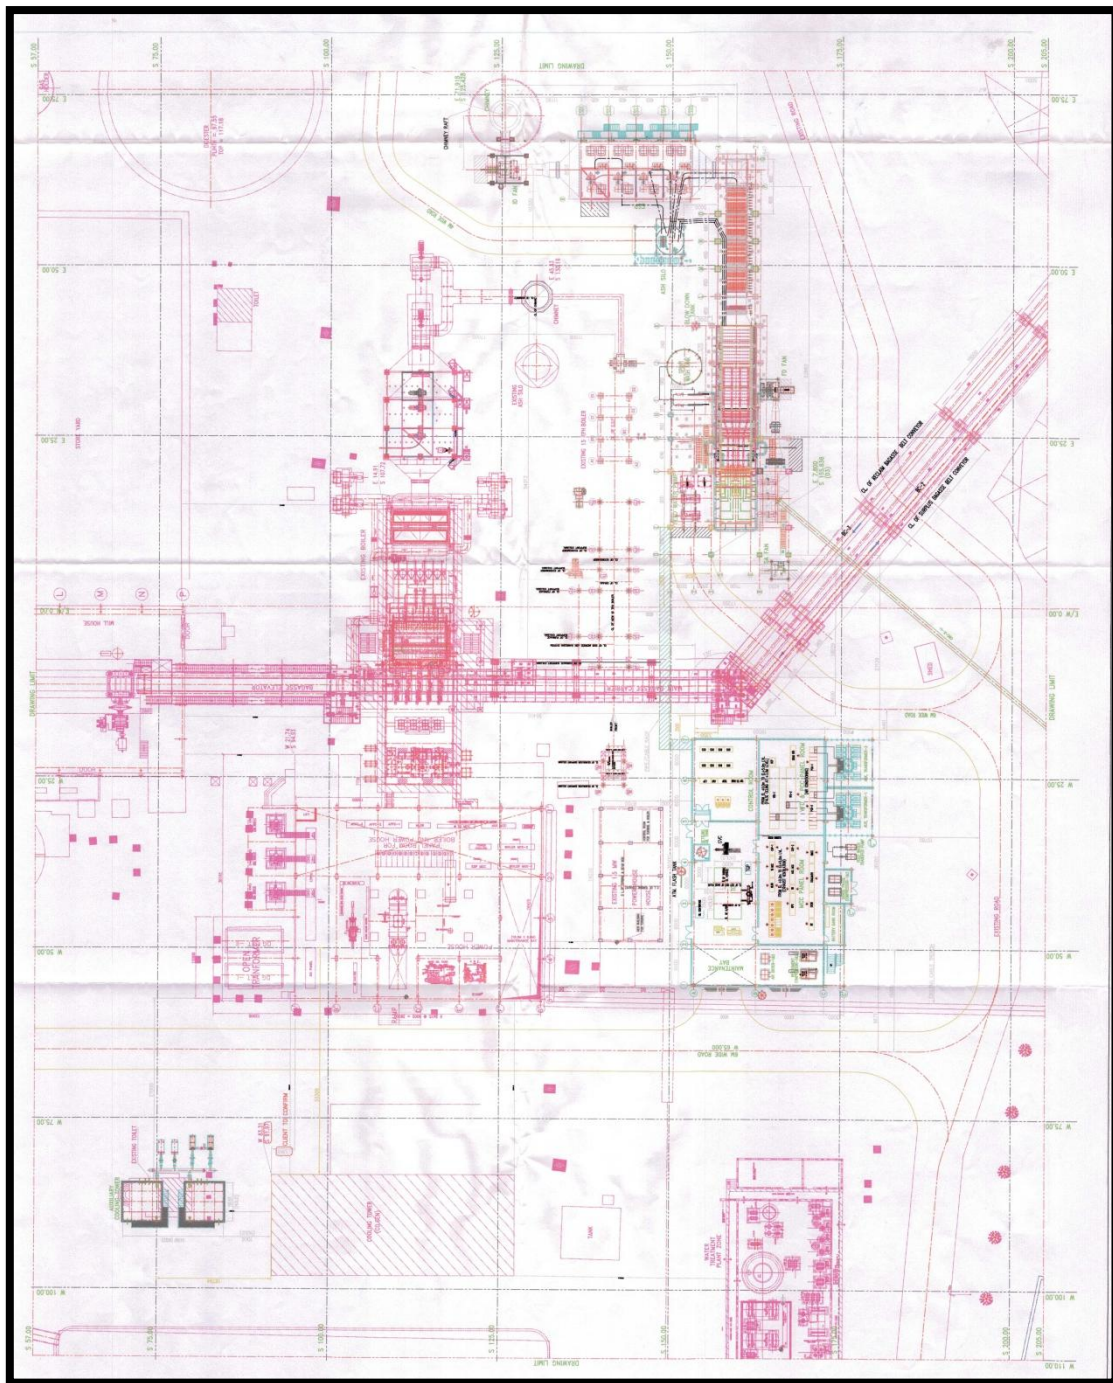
B: Sugar and Co-gen Plant Layout
